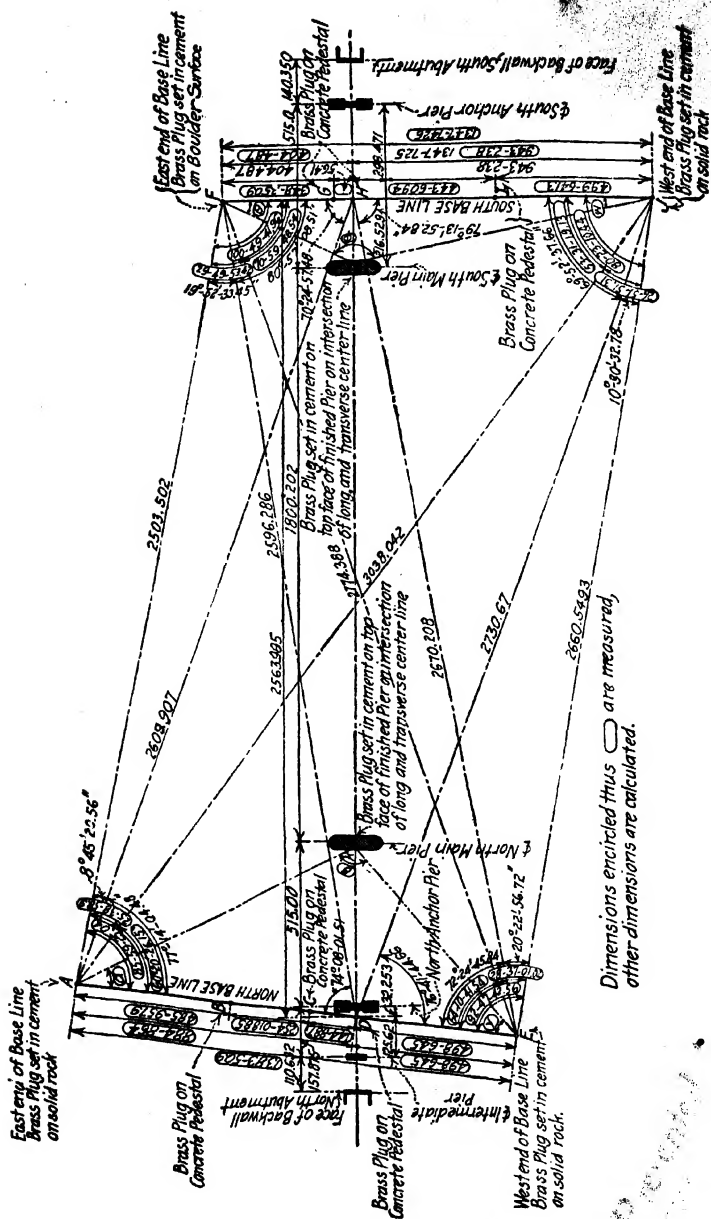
Triangulation survey for locating piers of the Quebec bridge.
